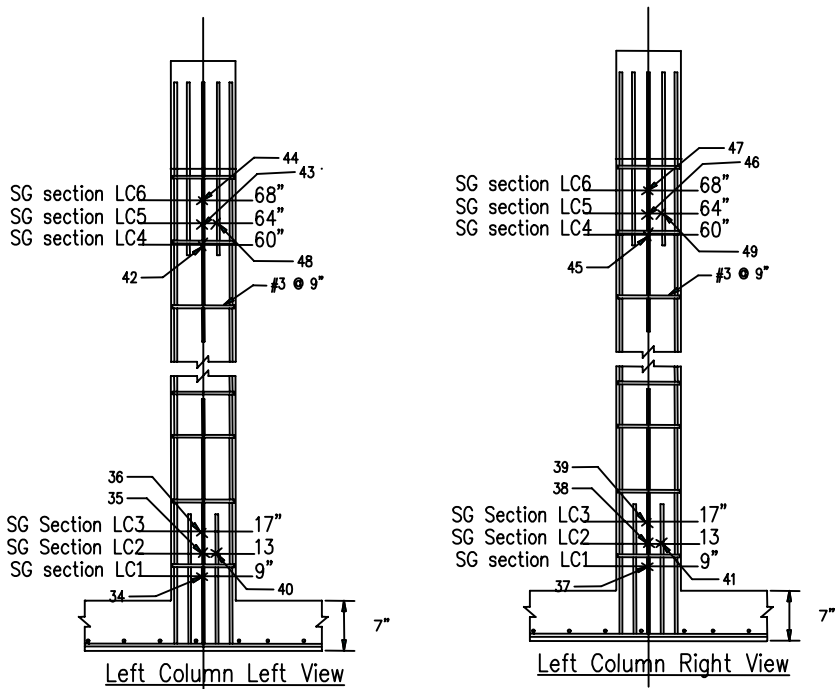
Steel Details and Gage Locations for the Left Column in B2SA
